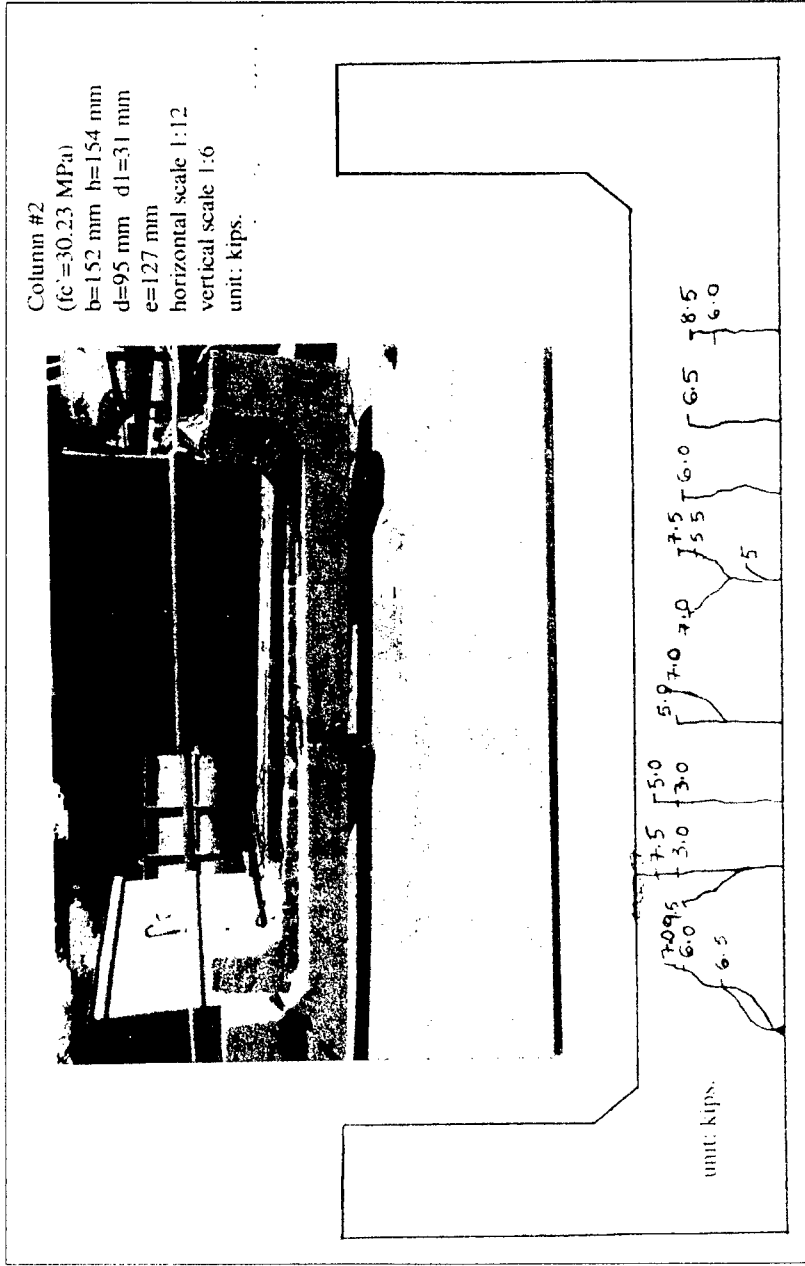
Crack pattern of column #2 (e = 127 mm Set I)
